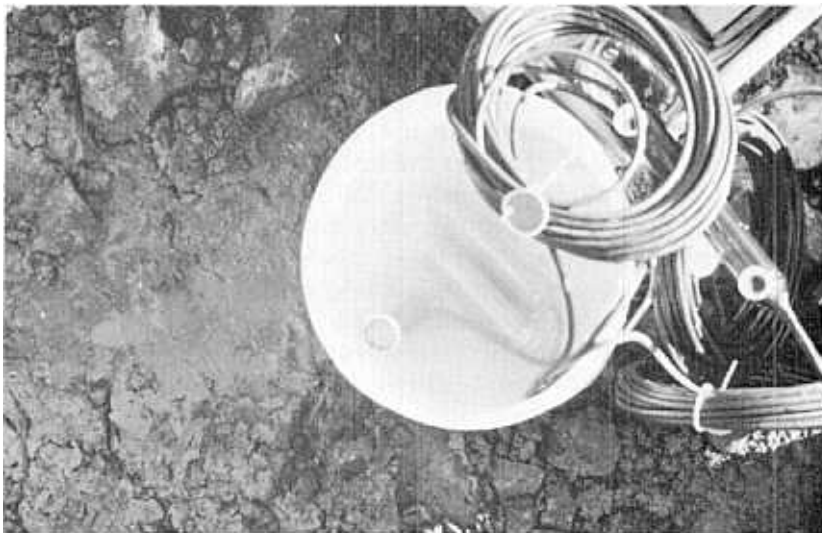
Reassembling vibrating-wire piezometer under cool water. P801-D-81011.
